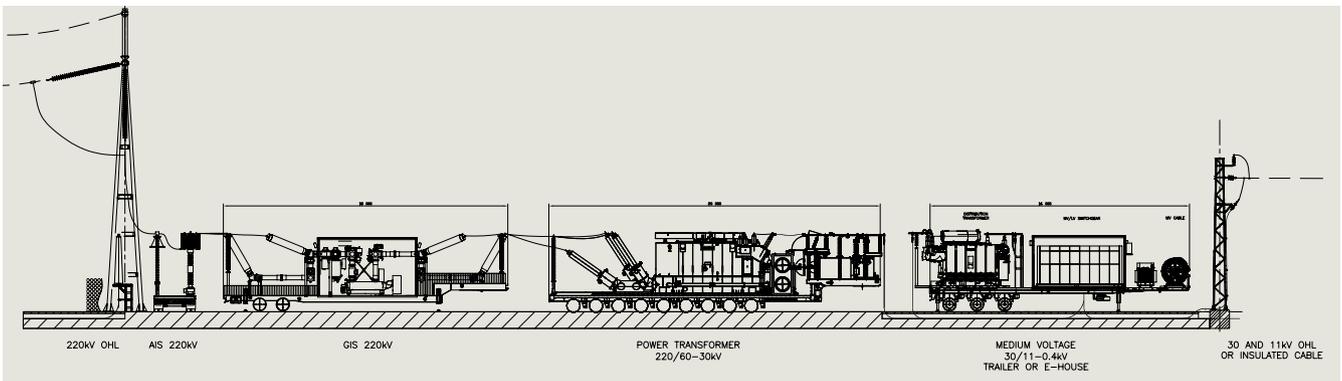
Layout for a typical 245 kV in/out Bay configuration
